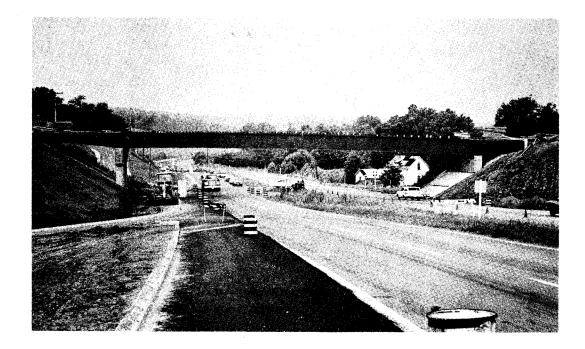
Profile view of the curved girder bridge showing the structural steel in place prior to construction of the deck.
